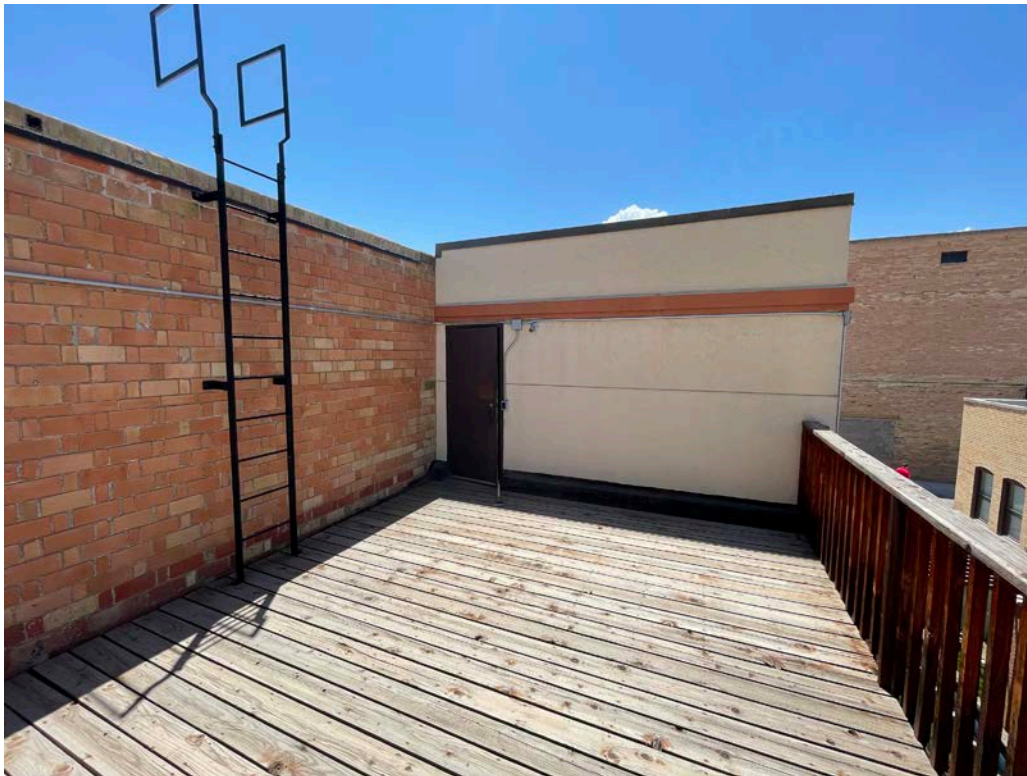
View west, second floor roof deck. Stucco wall represents western section of building.
